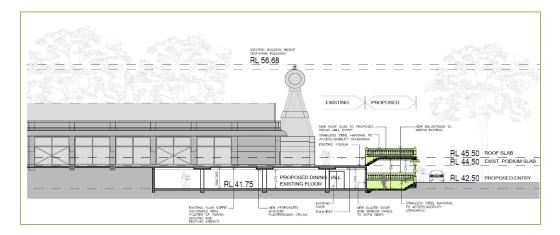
Section plan showing proposed development (Extract from Drawing No. A2.006, Rev 4, prepared by JEYA Architects, dated 04/01/2021)
